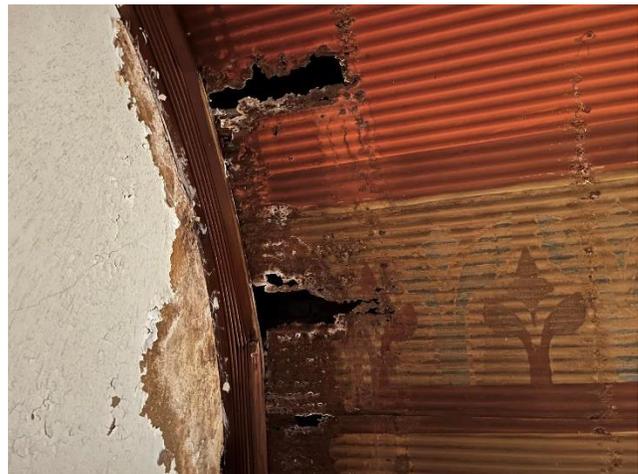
Rust deterioration at the decorative metal ceilings and water staining on adjacent plaster finishes.
